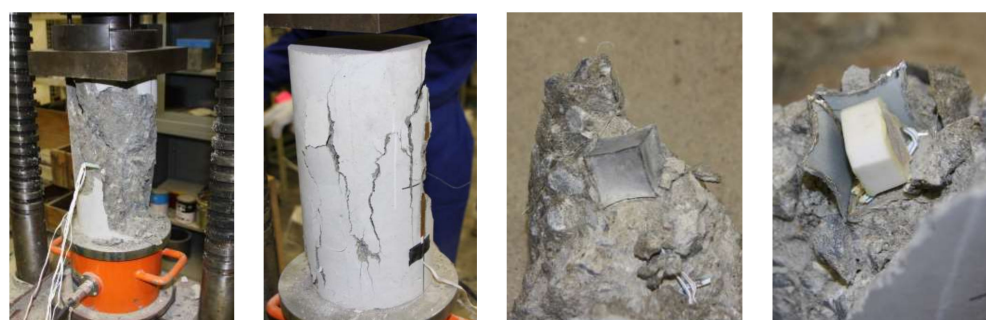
The failure mode of concrete specimens mixed with a single concave body.
